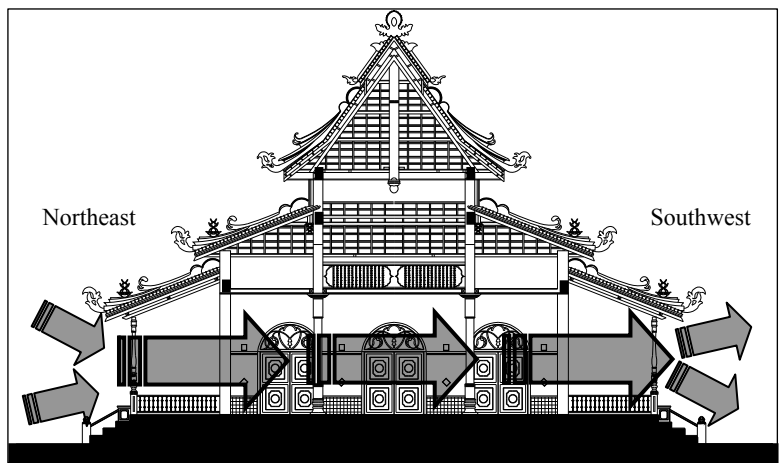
Cross air ventilation design analysis, viewing toward southeast facade
